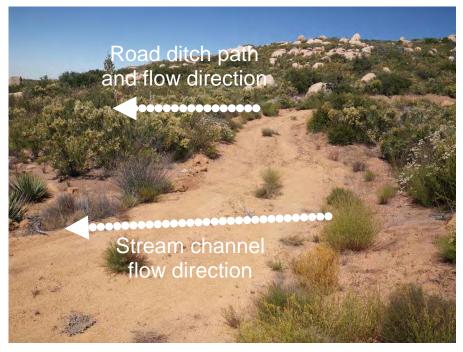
At Site 2-A looking at the lower-most road crossing of the stream channel that drains to the southwest grassland/meadow. The road ditch is also shown here.
